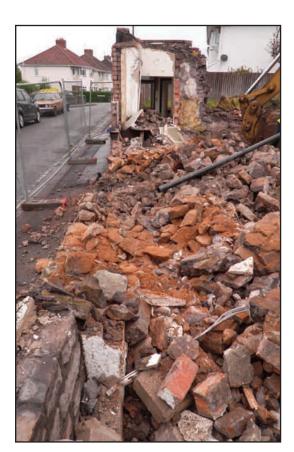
Demolished west end elevation with sections of original clay-bonded stonework visible, looking north
